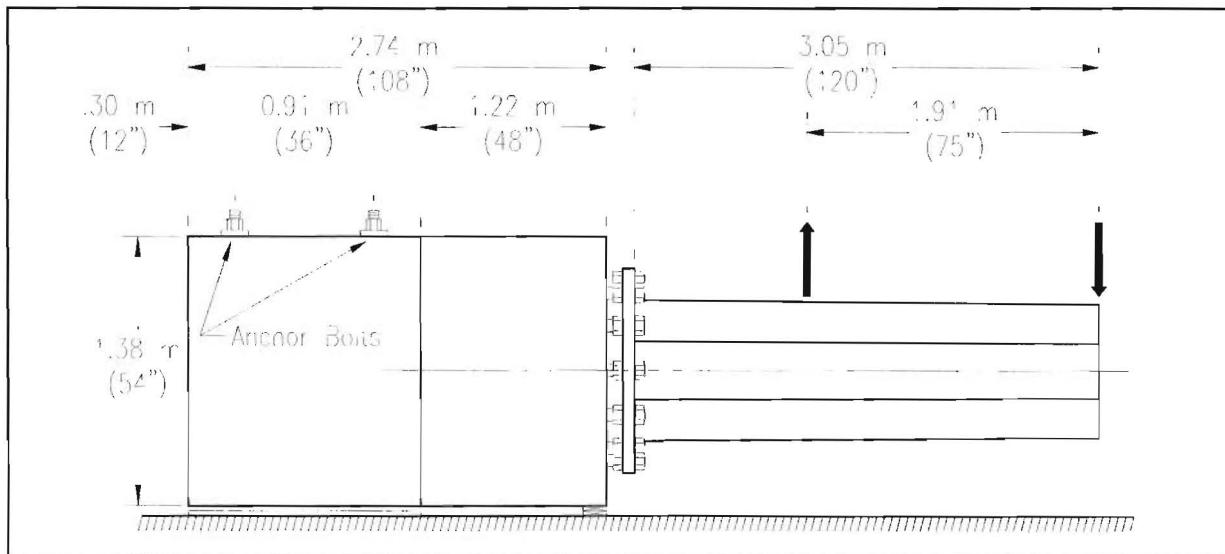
Loading configuration for HMIP 4 1/2 UNC laboratory specimen.
